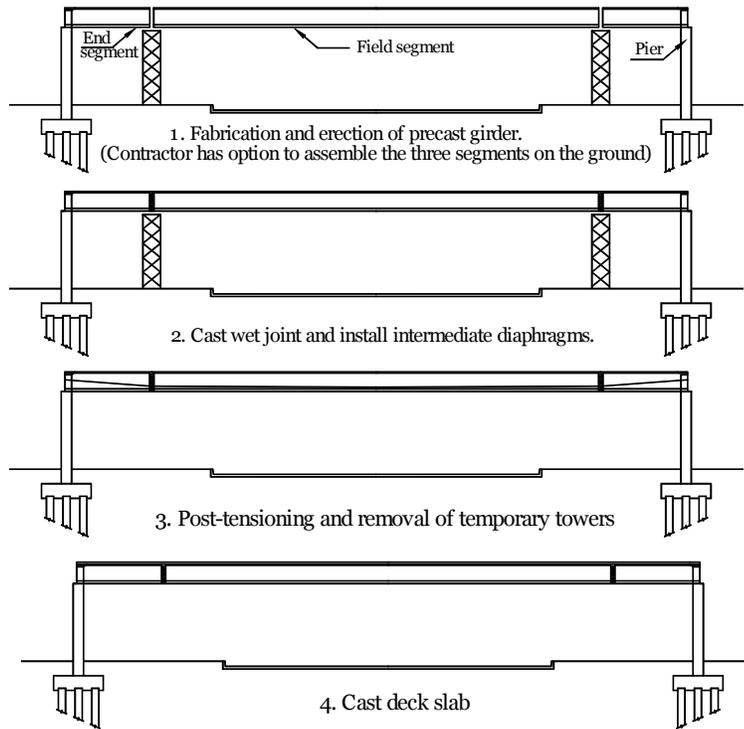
Construction Sequence of the 198th – Skyline Drive Bridge
